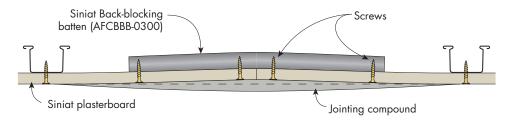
Creating a Recess on a Ceiling Butt Joint using Back-Blocking Battens Section
